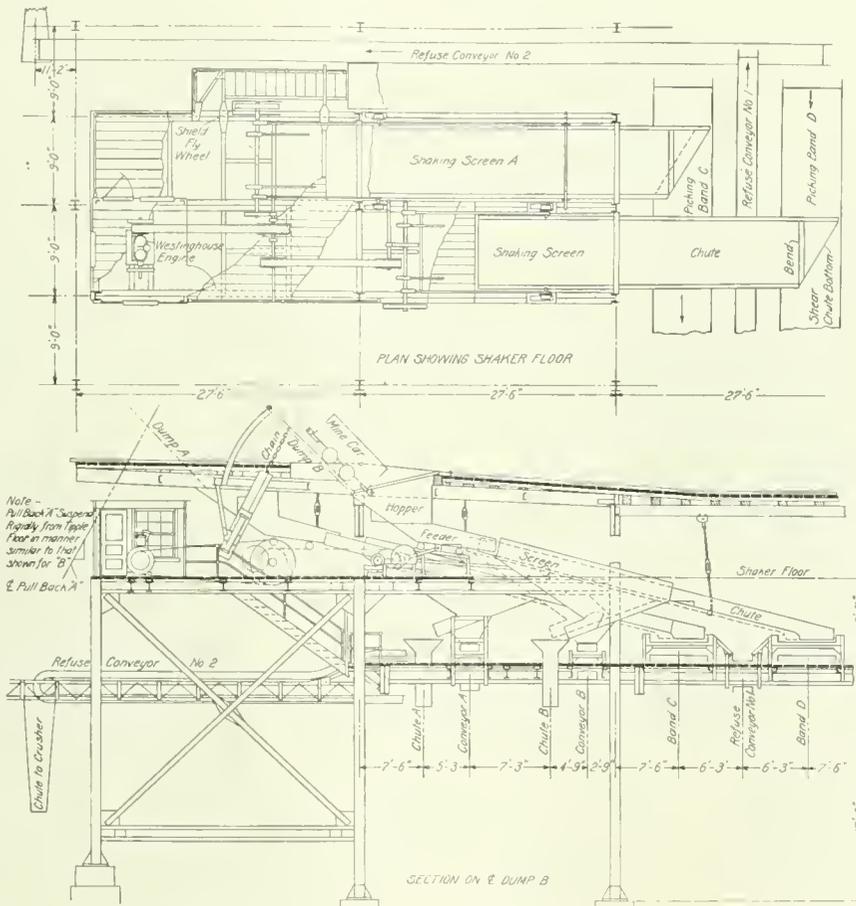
PLAN AND SECTION OF SCREENING FLOOR
